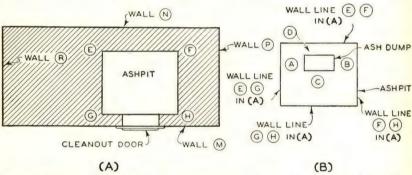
Horizontal Section View of Chimney Shown in Fig. 6 Illustrating Ashpit Door (A), and Position of Ash Dump (B)
